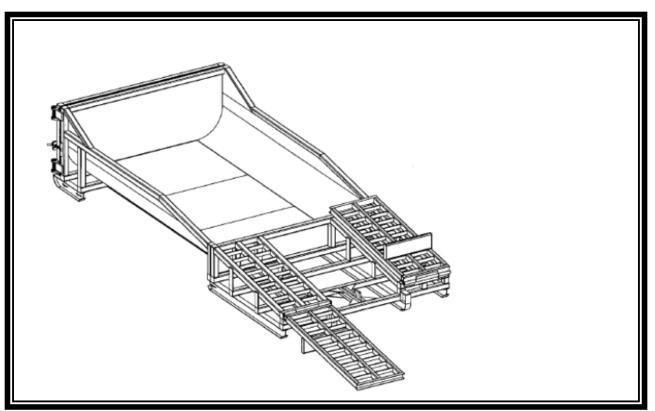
Prefabricated Concrete Washout Container w/Ramp
